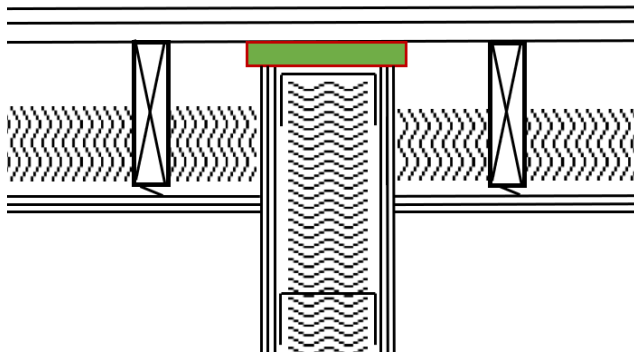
JUNCTION DETAIL OF SEPARATING WALL RUNNING PARALLEL TO JOISTS (INTERMEDIATE FLOOR)
